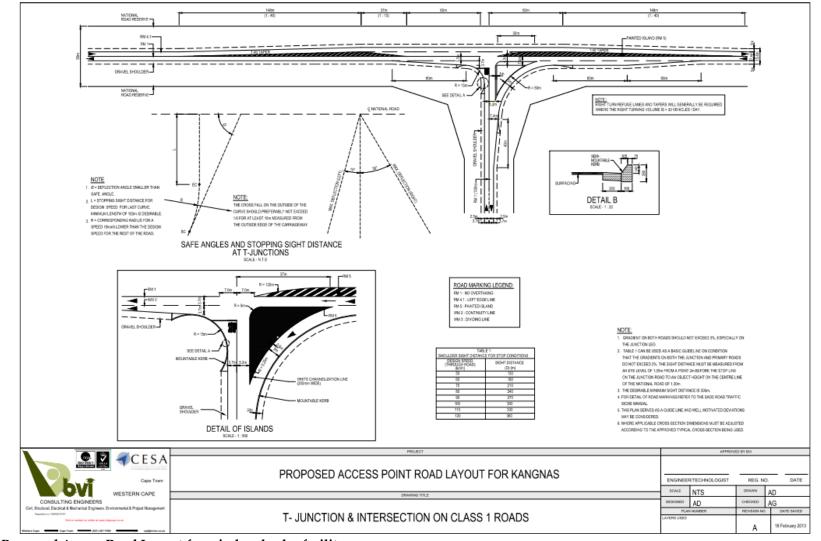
Proposed Access Road Layout for wind and solar facility
